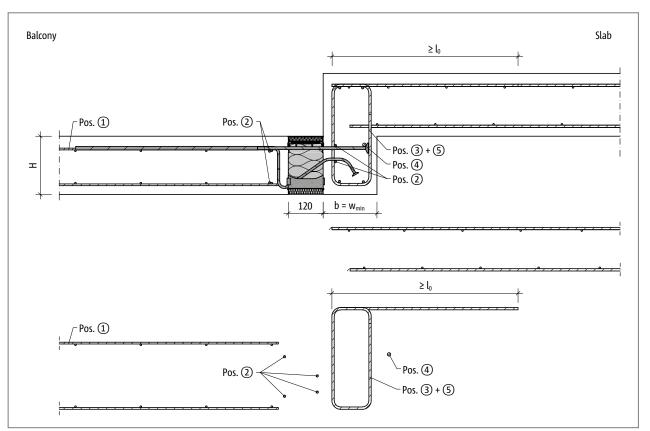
Schöck Isokorb[®] XT type K-U: On-site reinforcement for balcony with height offset downwards with minimum structural element dimension ($w_{vorh} = w_{min}$)
